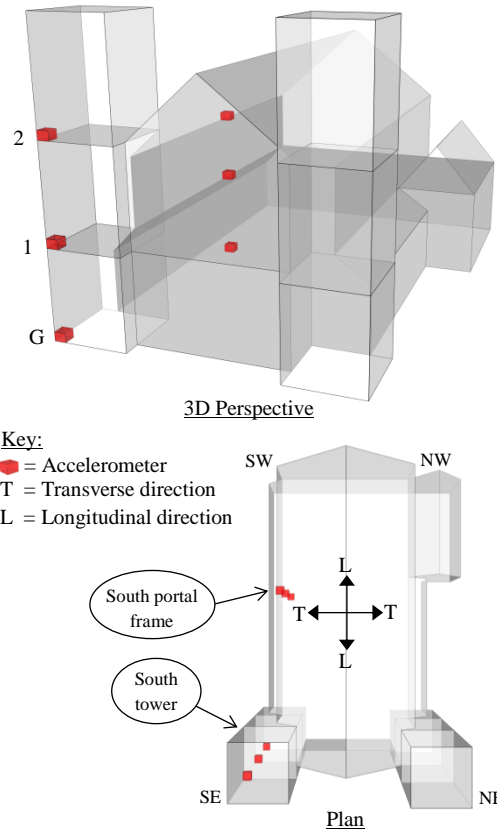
Layout and distribution of accelerometers in the Saint Mary of the Angels Church.
